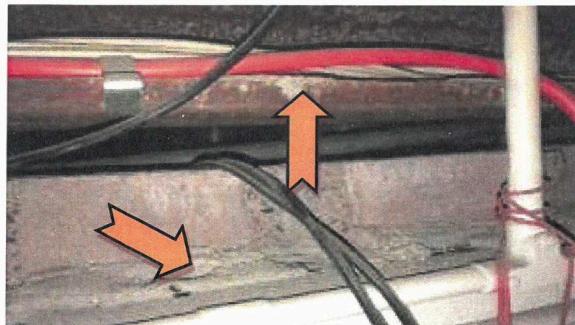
Level 23 – Plantroom – West wall of tank storage room. Loose asbestos debris on top of brick walls, below metal beams. Sample 22505-001-039
